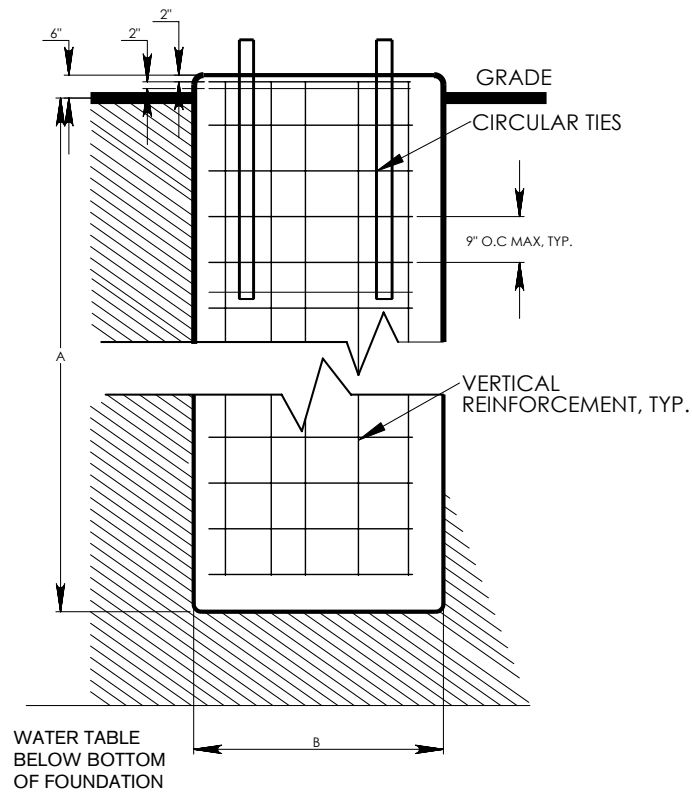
Technical drawing for Pier Foundation 33 ft. Tower
